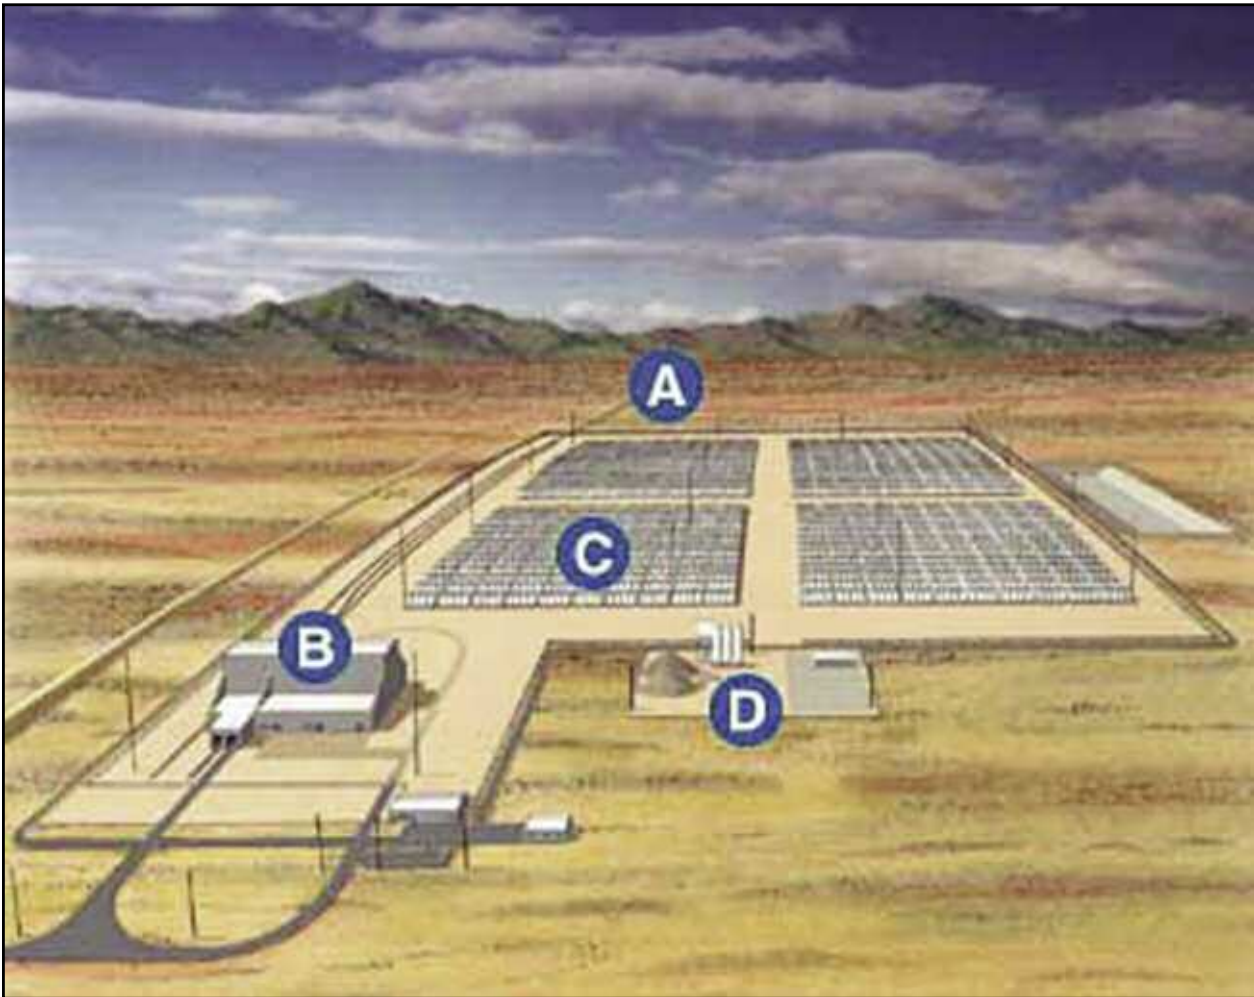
Diagram of PFS facility proposed for Skull Valley, Utah. (A — rail line; B — cask transfer building; C — concrete pads; D — batch plant for concrete overpacks.)
